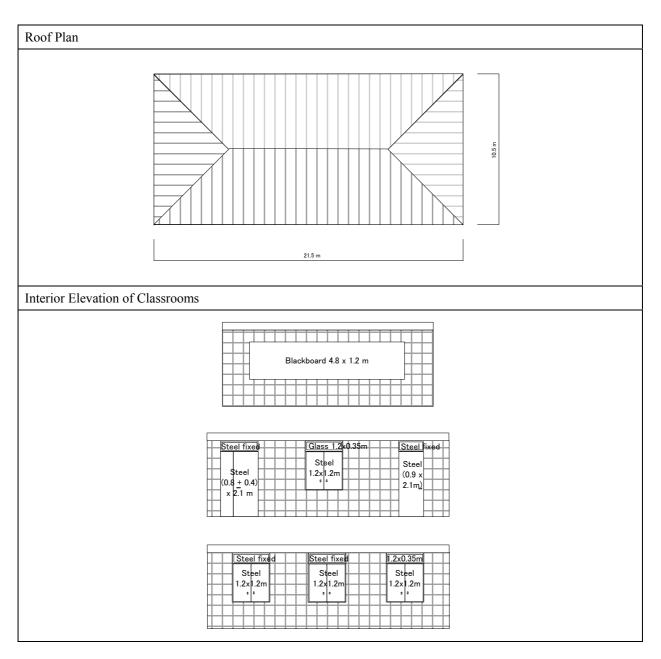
Drawings for Standard Classroom Building (Two Classrooms With Headmaster's Office and Store Room)
